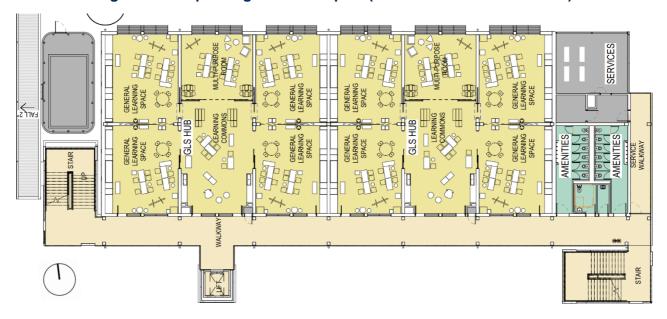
Proposed first floor plan (Source: Pedavoli Architects)
